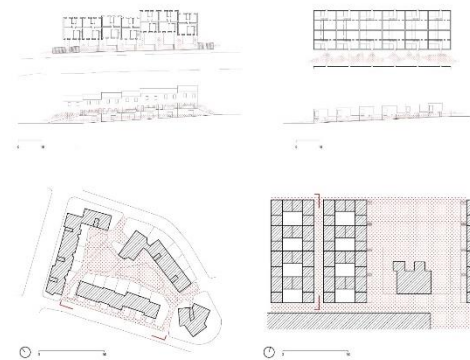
Transition in Ina-Casa Tiburtino (left) and Poblado Dirigido de Caño Roto (right): front and floor plan (portion). Drawing by author
